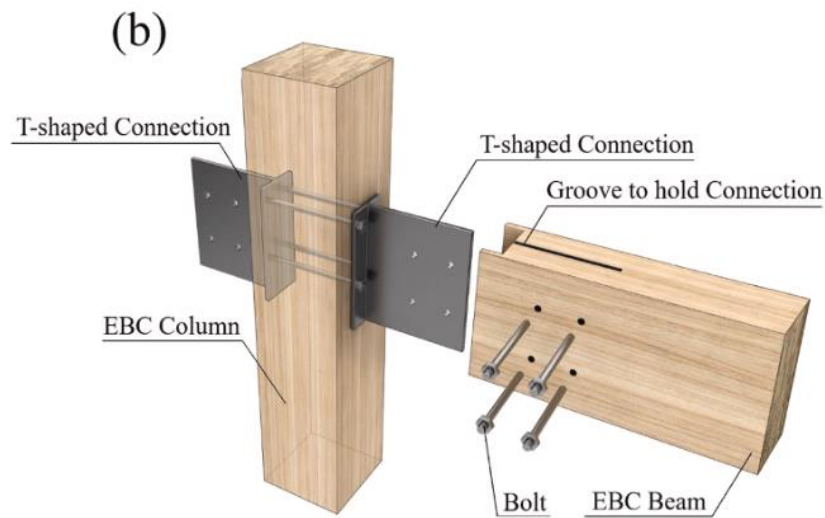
Structure showing T-shaped steel connections at beam-to-column joints.<sup>54</sup>
